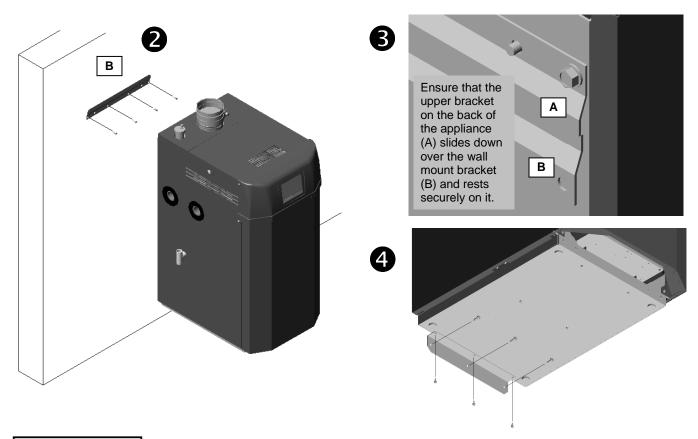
(b) Lx400 Model Wall Mounting Installations
